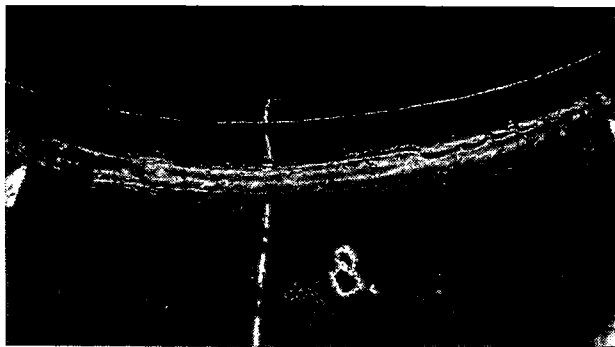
Fracture between flange and web of ideal structure no. 8 (dynamic tension)
